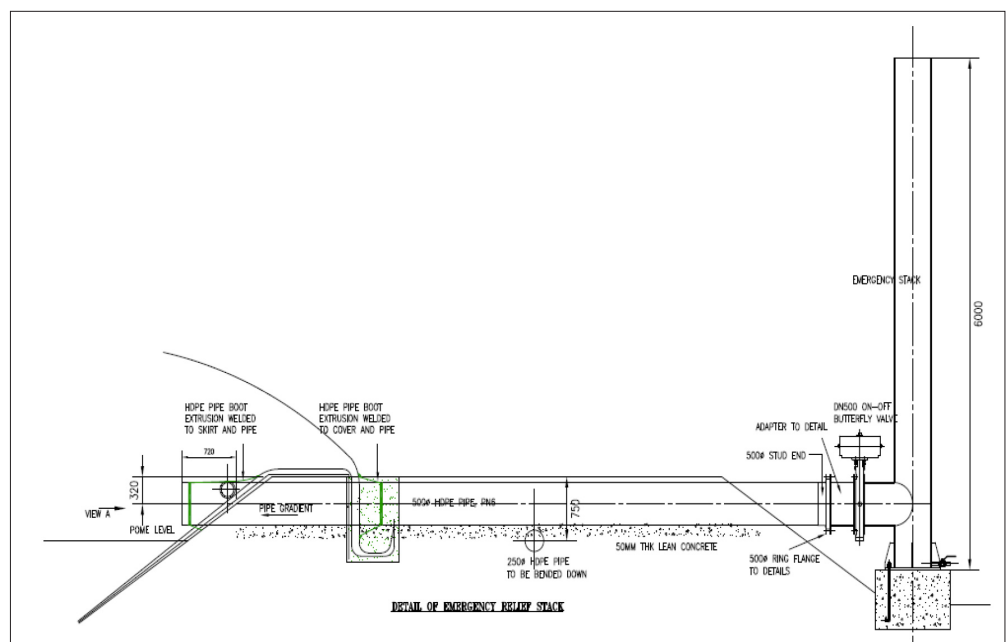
Detail of Typical Emergency Relief Stack (Source: FGV)
